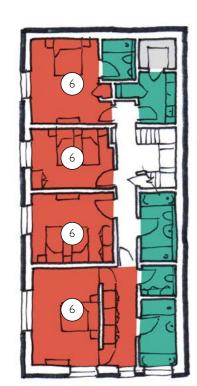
Dwelling 2 sketch lower ground floor plan
